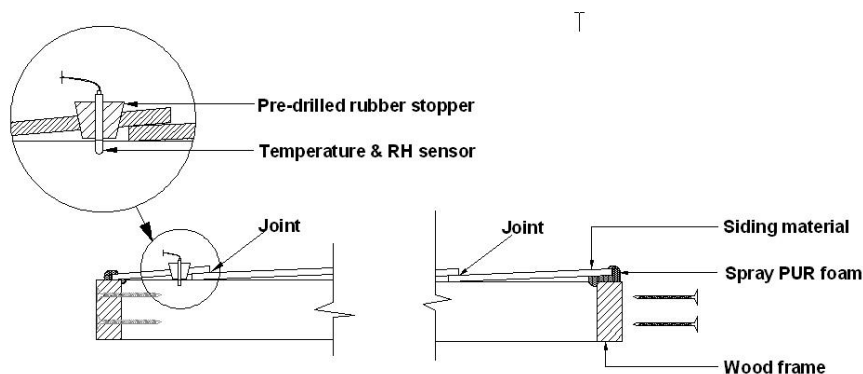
Cross section through a test specimen showing placement of the temperature and RH sensors.
